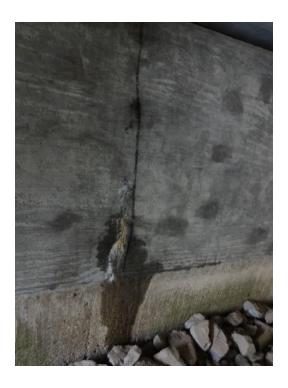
Leakage at cracks originating from interface of new and old abutment sections
